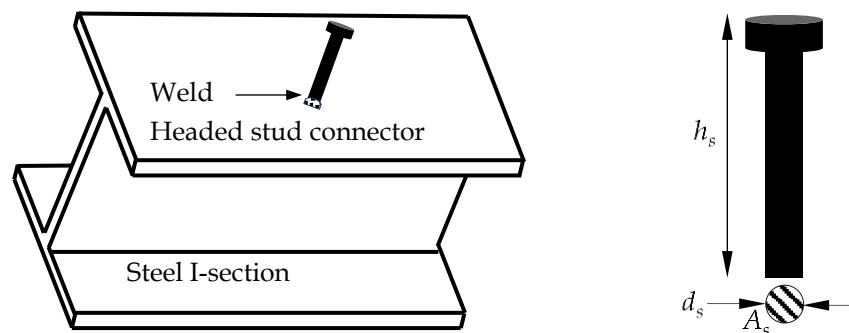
Headed stud shear connector welded over steel-section and typical geometric details
